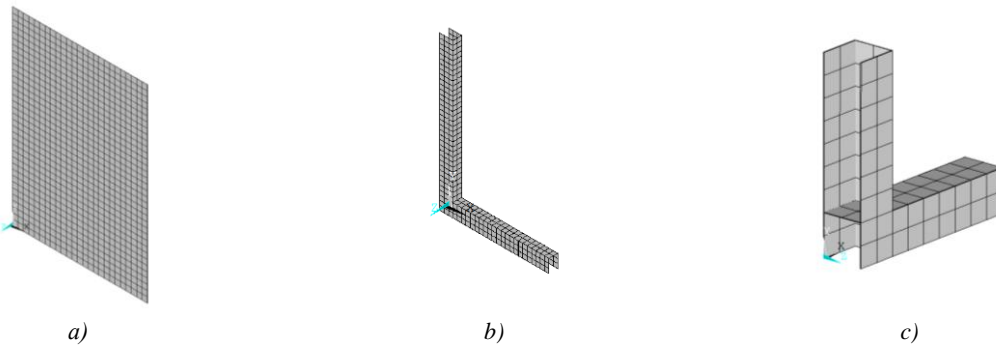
Equivalent reinforcing layers: *a* — layer for background reinforcement (upper/lower); *b* — girder reinforcement layers; *c* — column cap reinforcement layers (the authors' figure)
